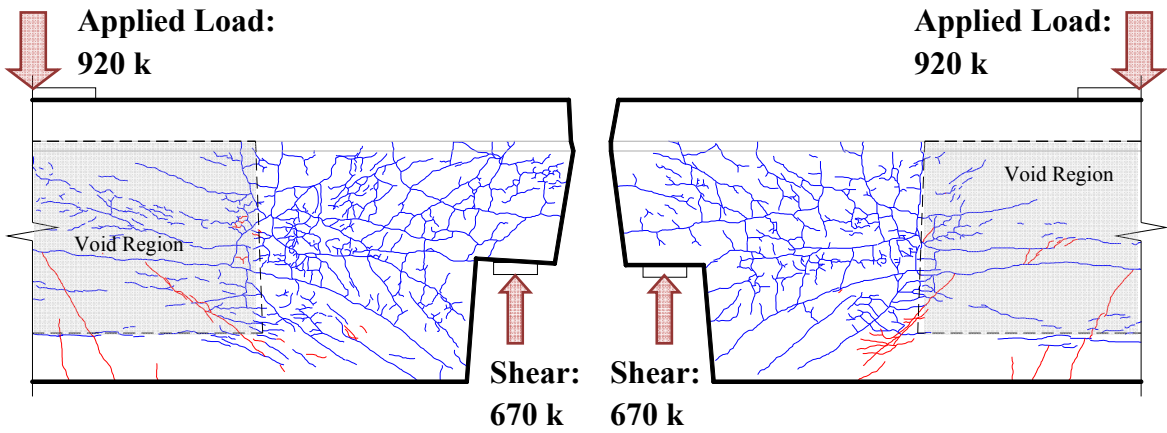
Cracking in beam RF-3R-9(c) on the east (left) and west (right) sides prior to failure.
